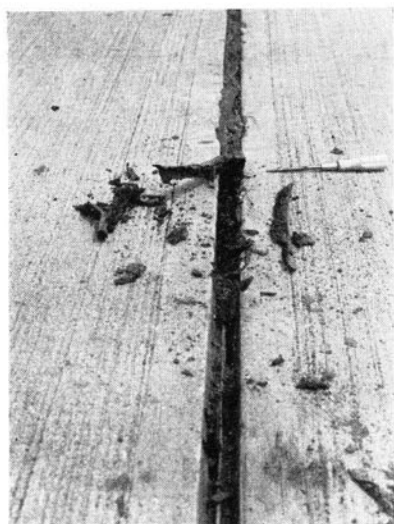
(AT LEFT). J-1 EXPANSION JOINT AT STA. 5 + 75, WITH ASPHALT CAP
